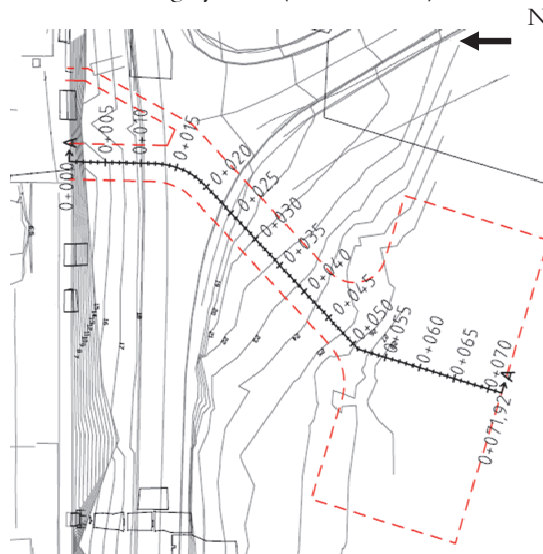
Layout of Veidekke access tunnel and gallery excavated at Norra Djurgården, Stockholm (Karlsson, 2014).
